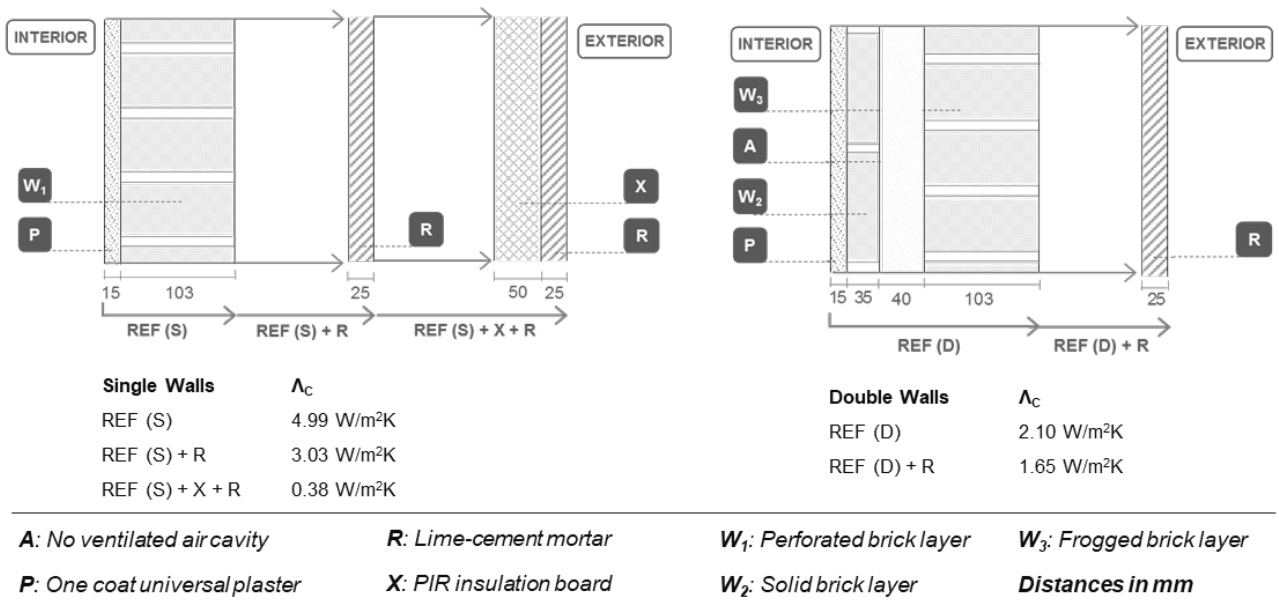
Vertical cross section of wall layouts (Λ_c = designed thermal conductance)
